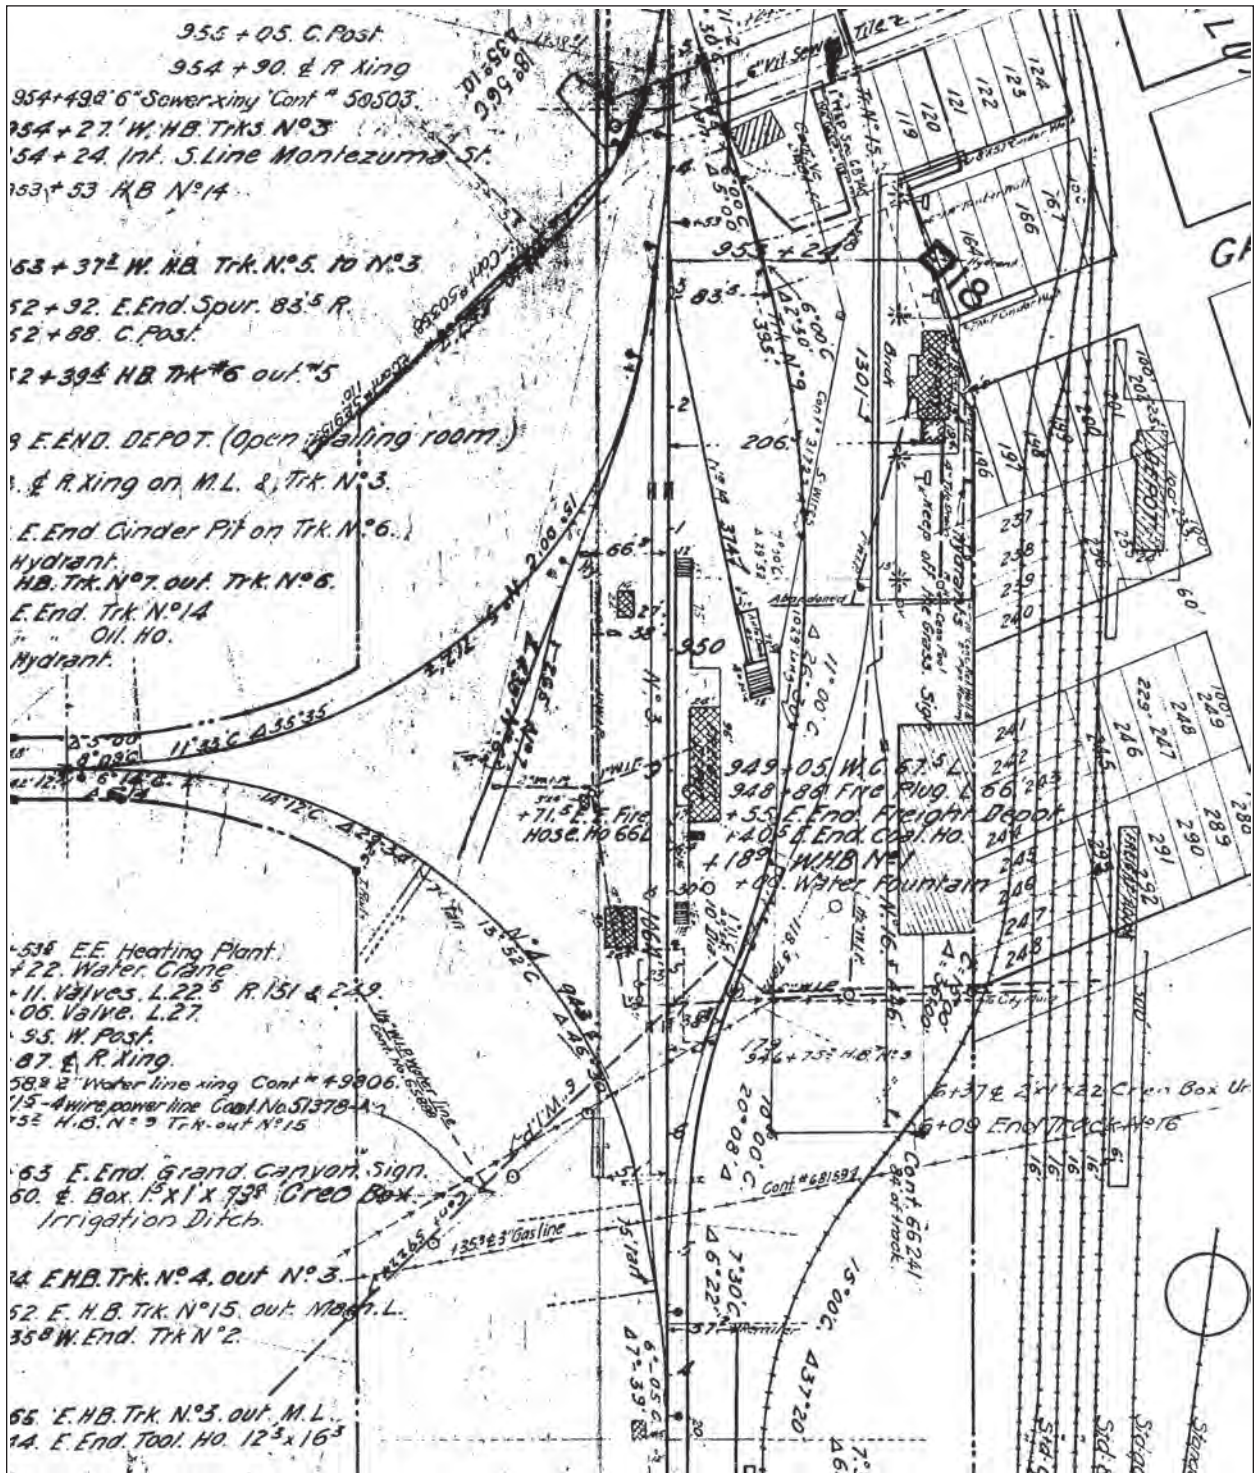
Santa Fe Station Map – Tracks and Structures, Santa Fe Co., New Mexico: Atchison, Topeka and Santa Fe Railway western lines, New Mexico Division, Santa Fe Branch, showing Station 908-38 to Station 958+77.3; map dated June 13, 1916, corrected to July 15, 1919; Dec. 31, 1925, and possibly 1935 and two additional and illegible dates; Office of Chief Engineer, Amarillo, Texas (courtesy the collection of Joe Brown).
